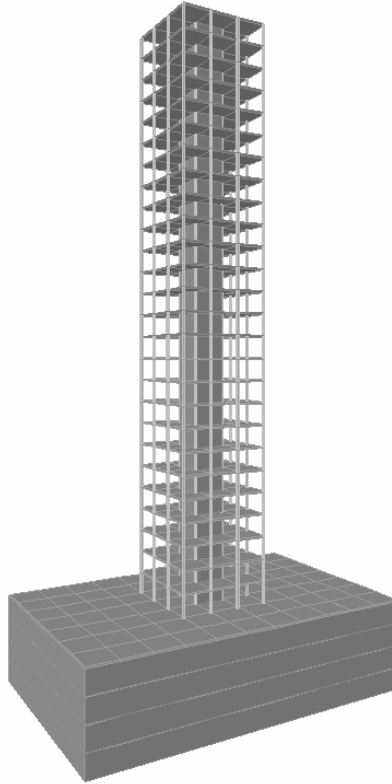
Structural system in a typical high-rise concrete shear wall building including the underground portion of the building.
